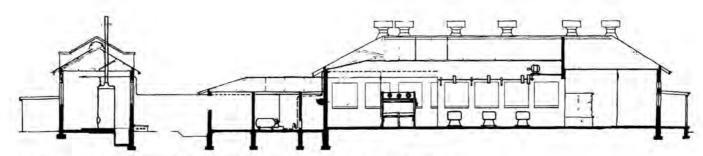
Section through boiler house, wash house, receiving room, etc.
